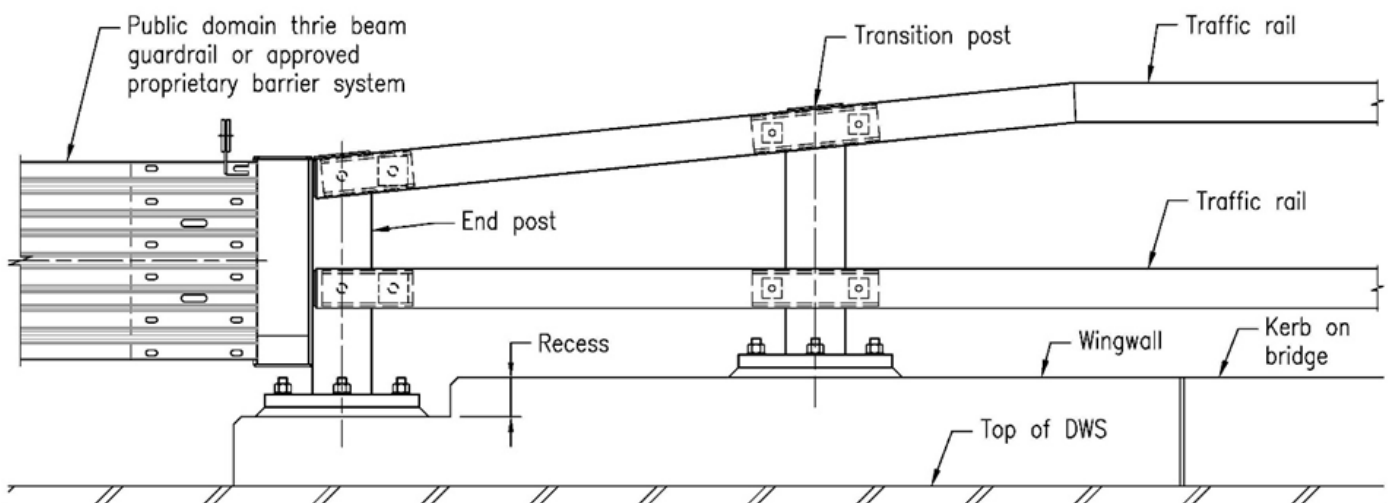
(d) - Conduit treatment and guardrail connection for post and rail traffic barrier
